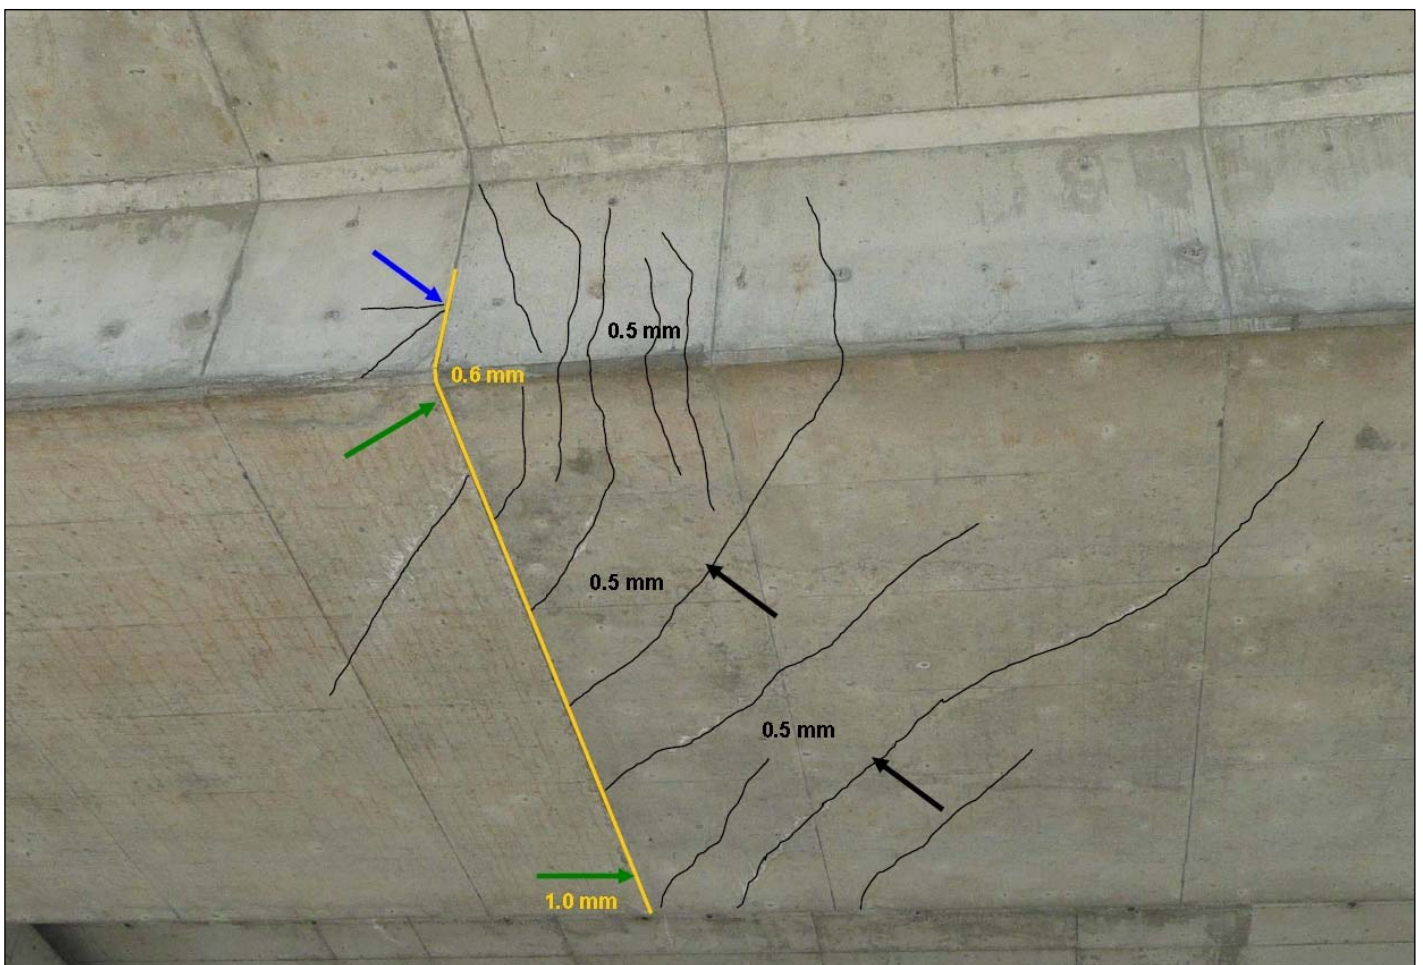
Cracking at location of coupling joint of pre-stressing cables
